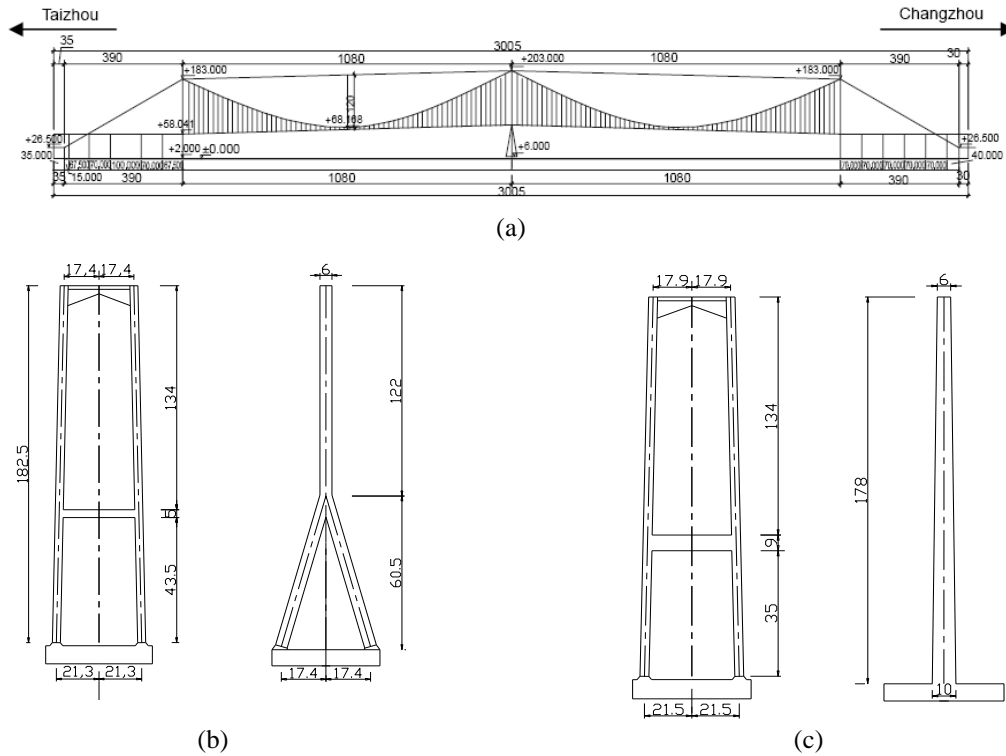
general layout of the Taizhou Highway Bridge over the Yangtze River (Unit: m): (a) vertical layout of the example bridge, (b) the center tower, (c) the side tower
